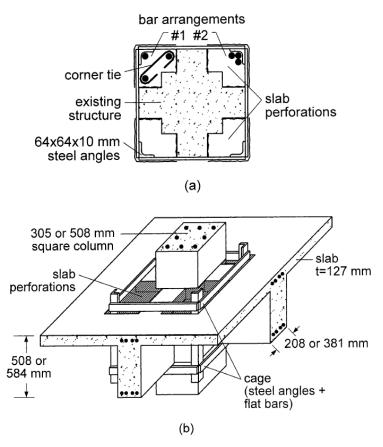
Corner jacketing technique studied by Alcocer and Jisra: (a) plan, and (b) perspective
